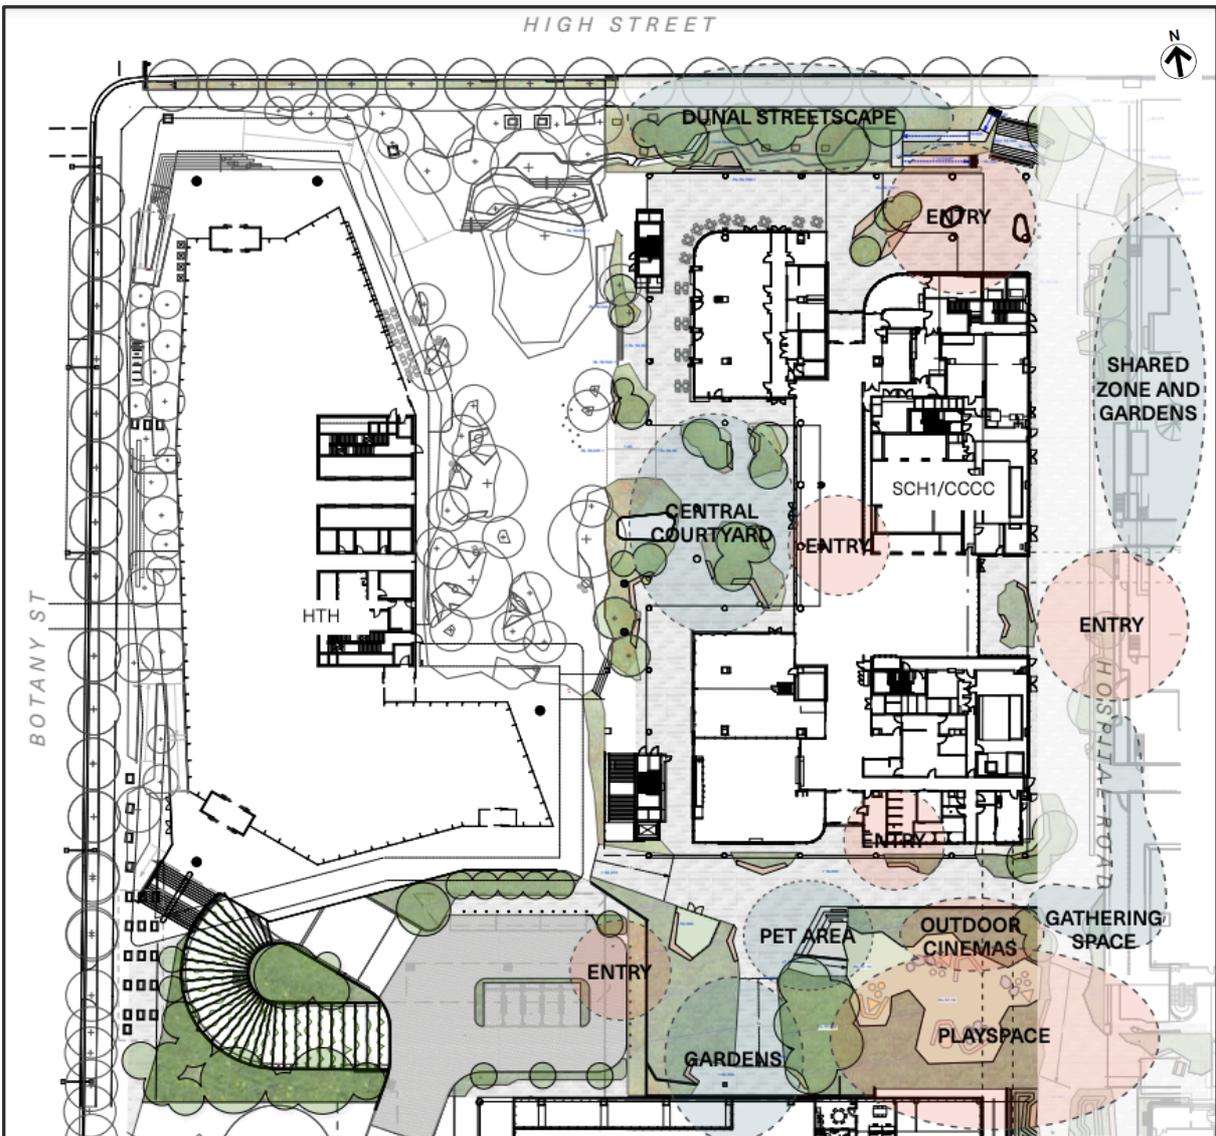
| Extract from landscape plans indicating site layout (Base source: RtS Landscape Plans)
